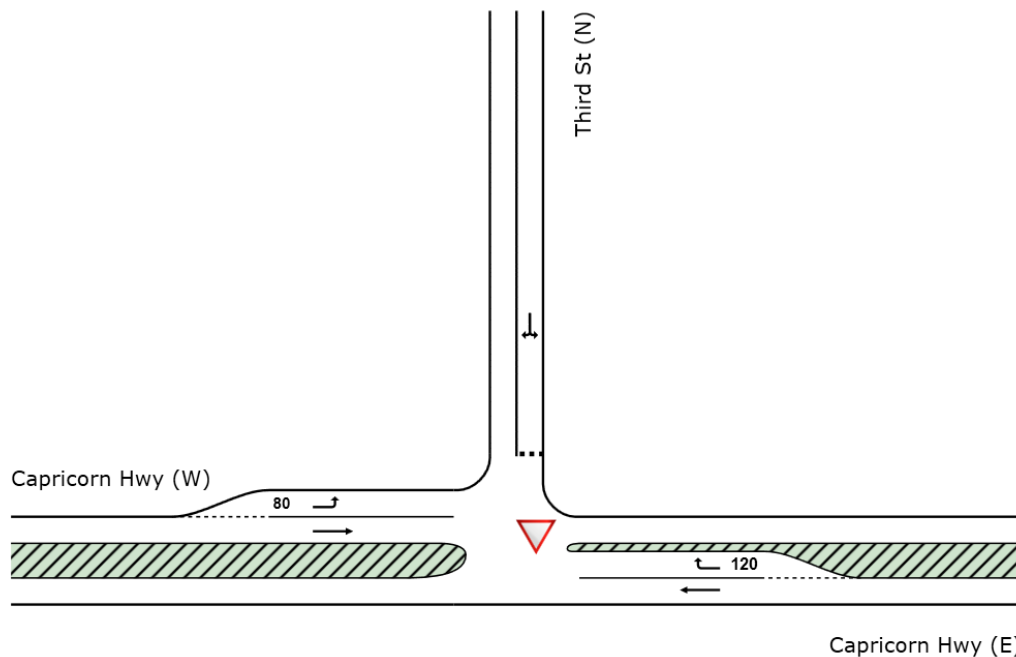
Capricorn Highway / Third Street SIDRA layout
